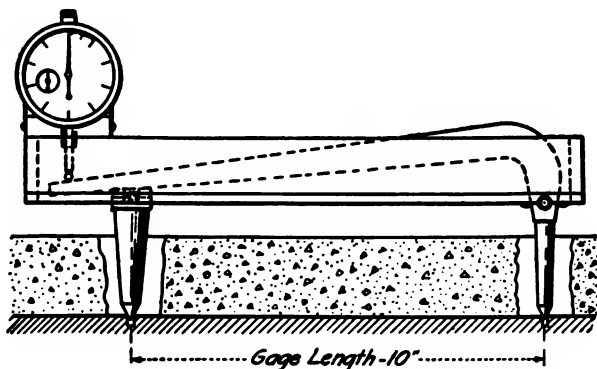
Extensometer Used in Measuring Deformations in Steel and Concrete.
